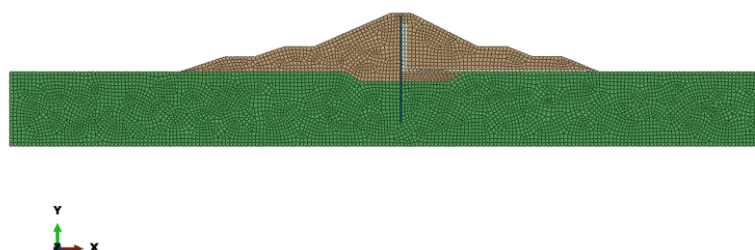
mesh finite element Raz & jargalan dam by method applied seal's wall 100 centimeter proposed
